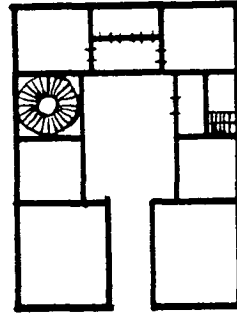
Palladio: plan sketches for a palace (RIBA XI/22v)
